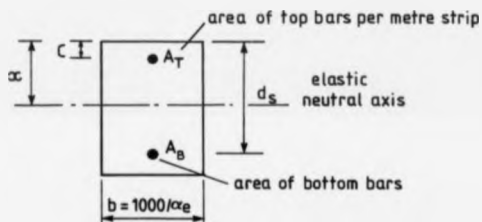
Transformed cross-section of reinforced concrete slab
